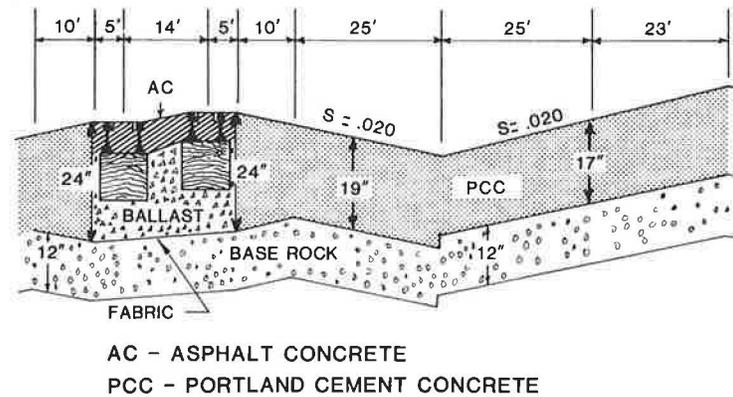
Cross section through pavement showing 1/2 width between loading tracks.
